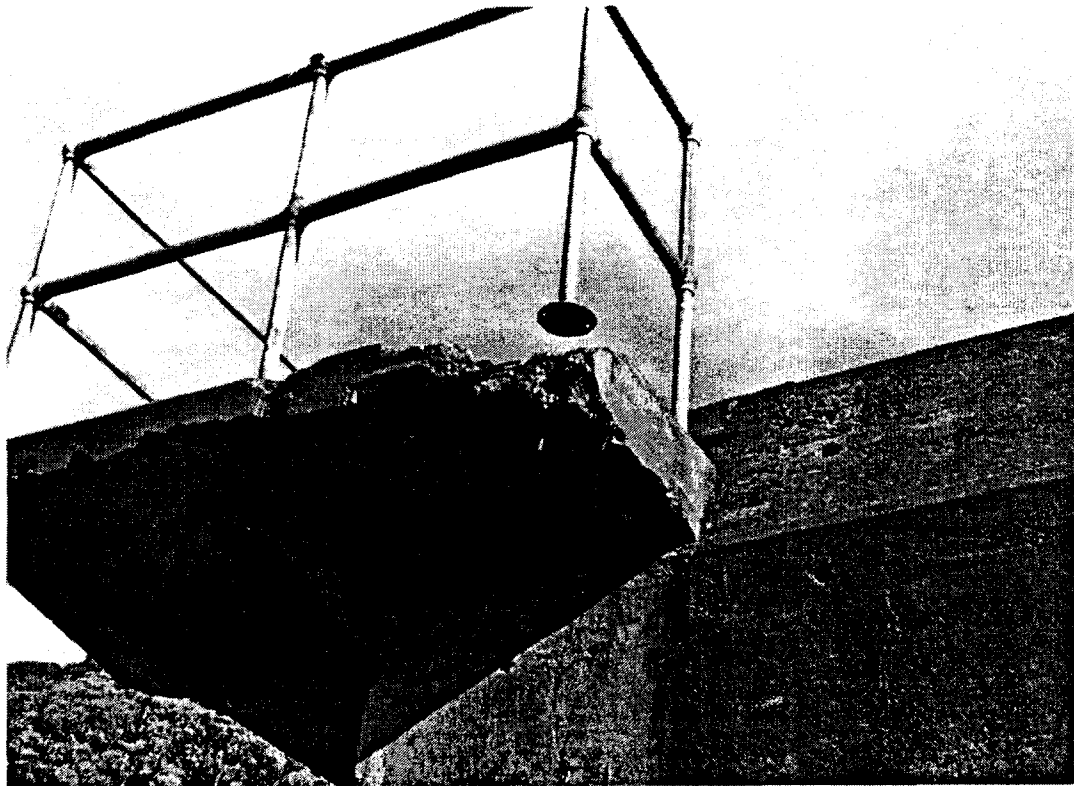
Major spalling and loss of concrete, underside of the battery commander's walk, Battery Kirby, Fort Baker, constructed 1899-1900. Battery commander's walk added after 1904.
